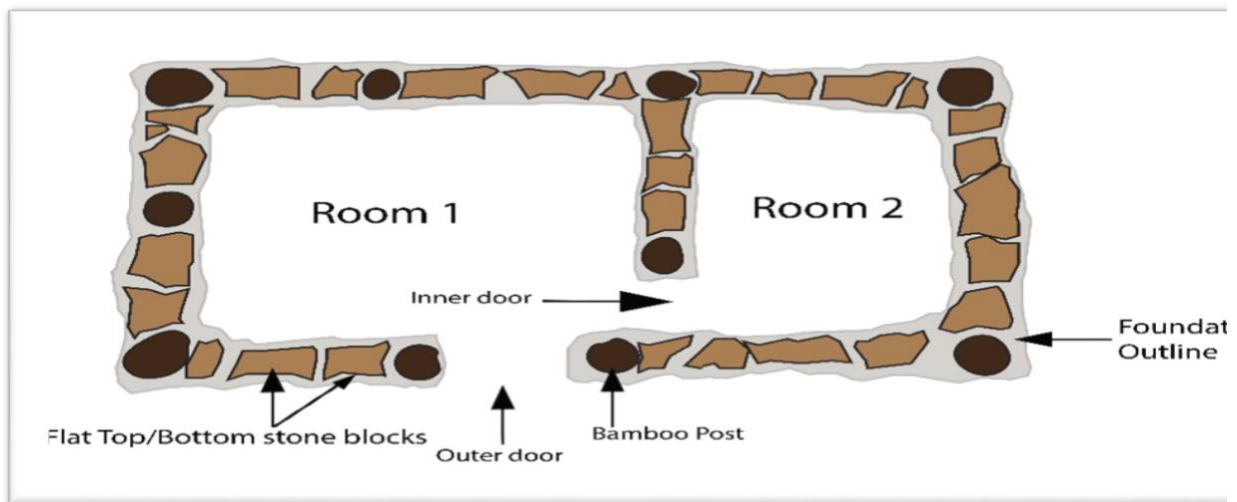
Schematic aerial view of vernacular house foundation (illustration: Author).
